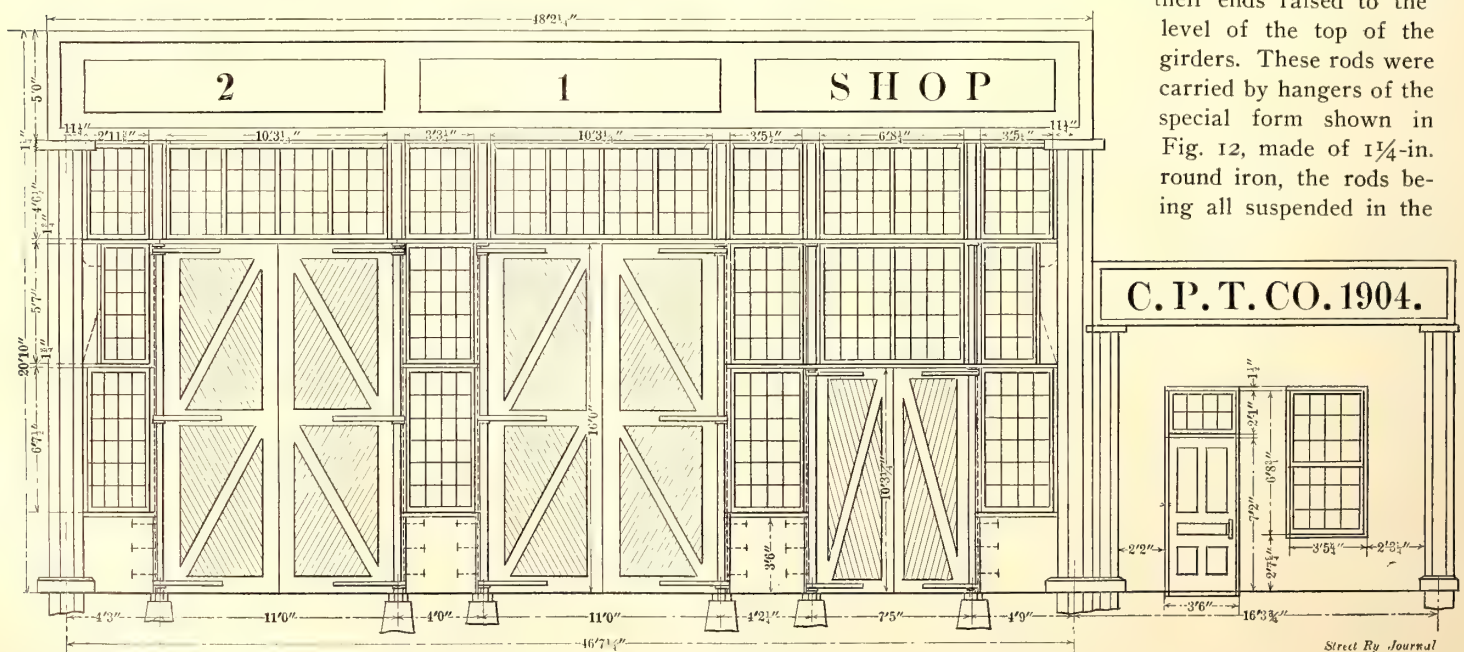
FRONT ELEVATION OF CAR HOUSE BUILT FOR THE CENTRAL PENNSYLVANIA TRACTION COMPANY
